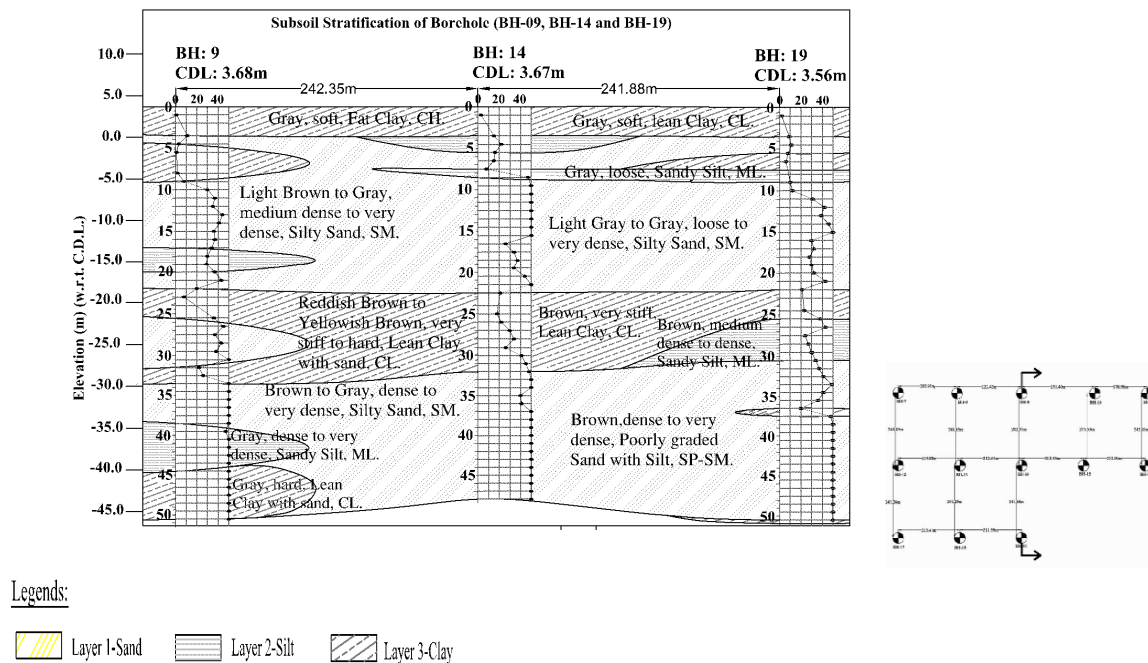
Subsurface section (BH-9~BH-14~BH-19)
